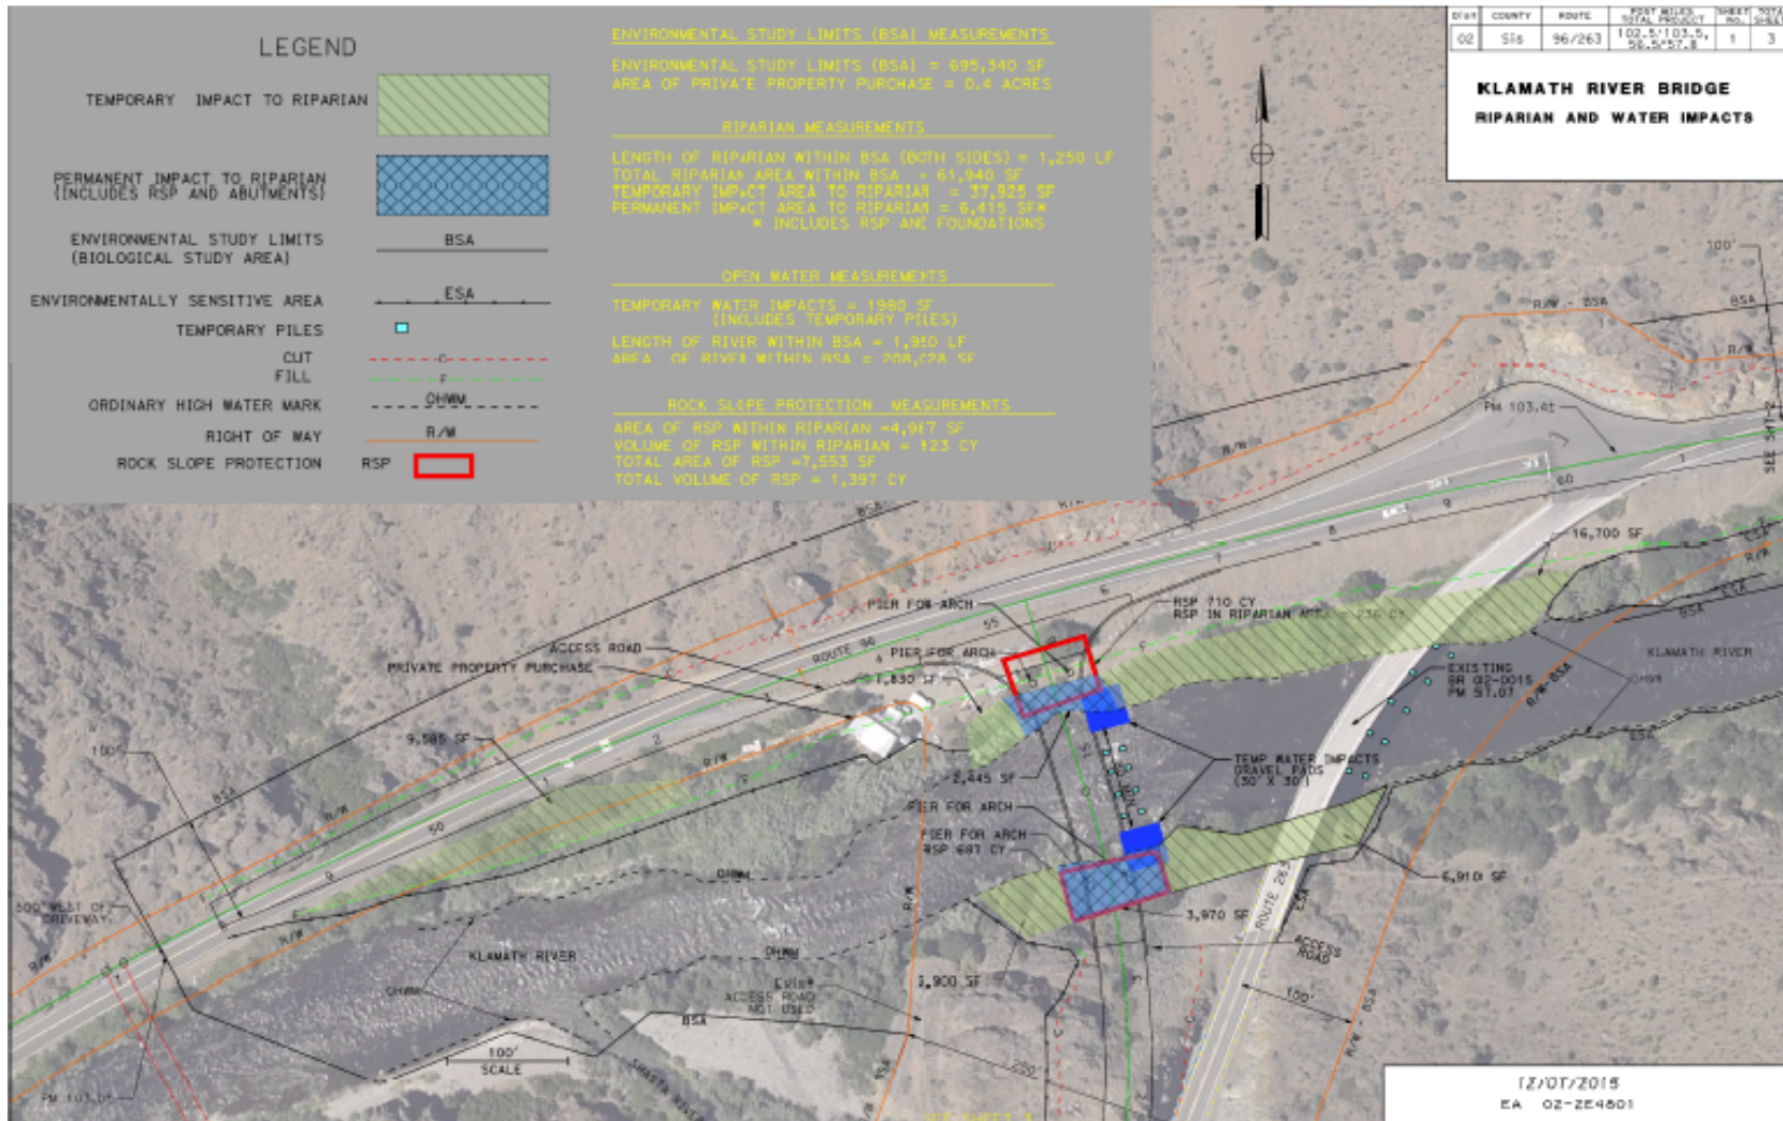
Riparian and water impacts of Klamath River Bridge on SR 263 at SR 96, and new alignment plans for proposed bridge replacement (Caltrans 2016).
